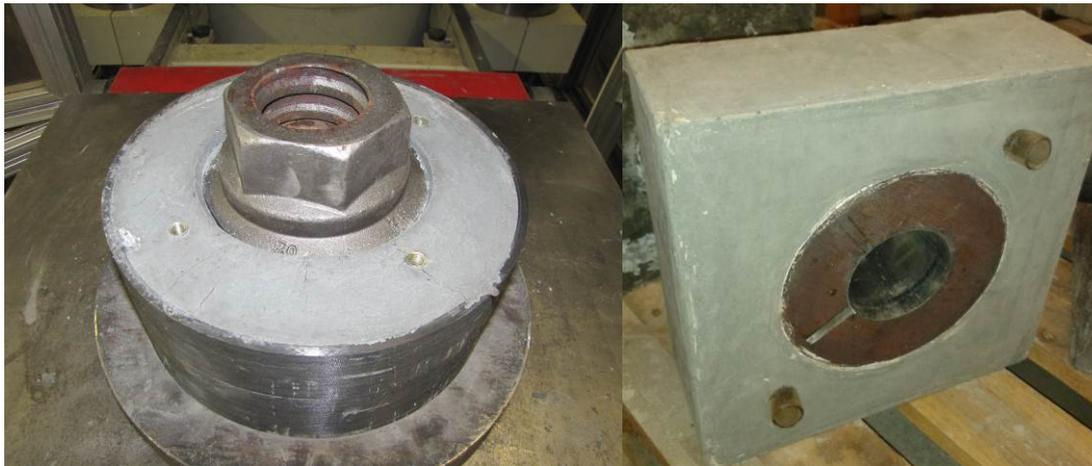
Prototype with carbon fibre ring (left) and concrete anchor plate with inner reinforcement, washer plate and injection pipes
